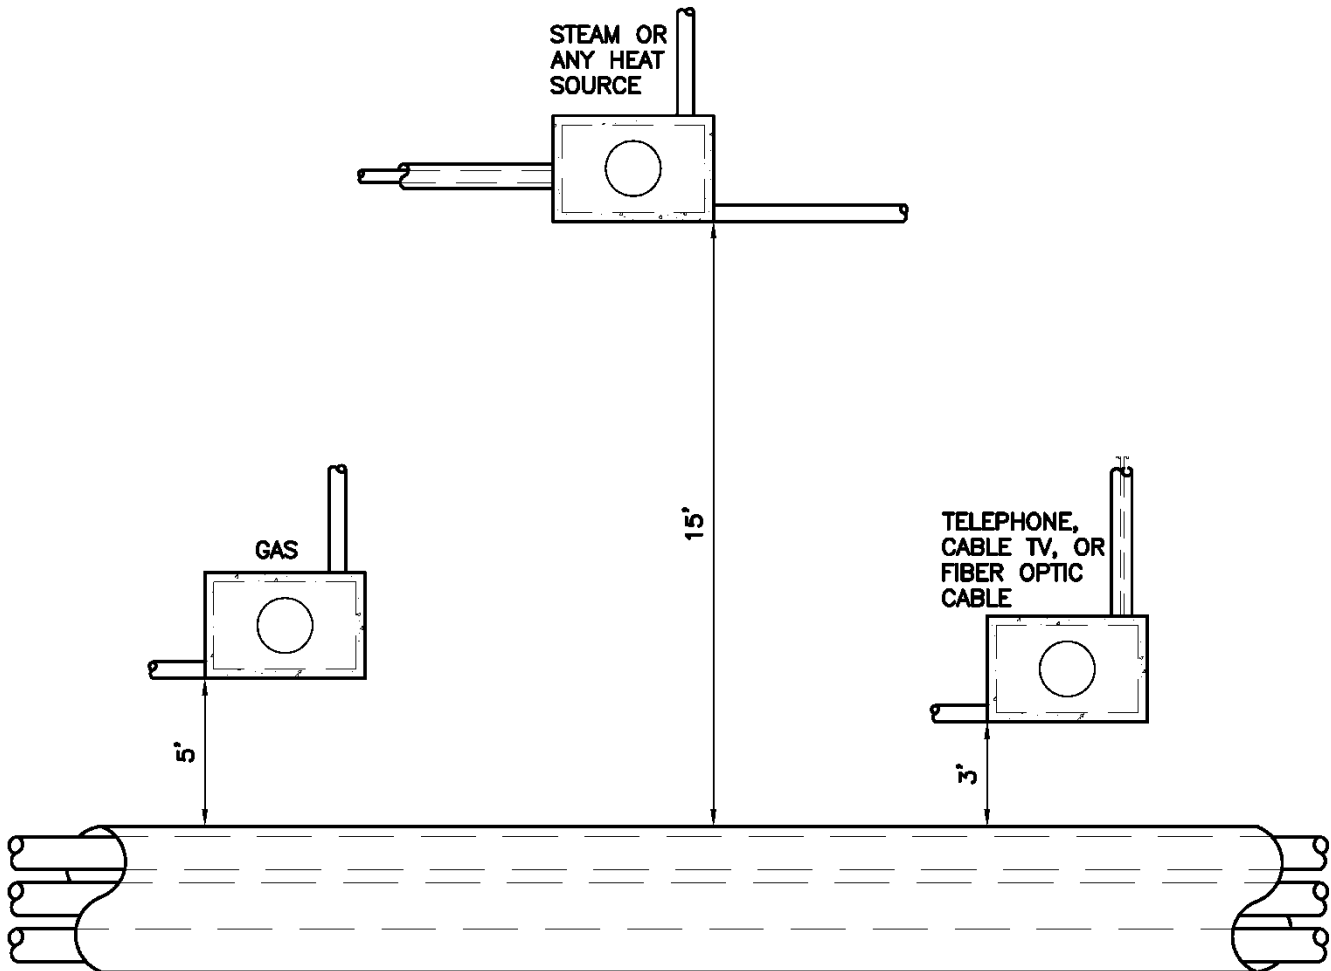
Minimum Horizontal Clearance, Water Structures, Plan View
